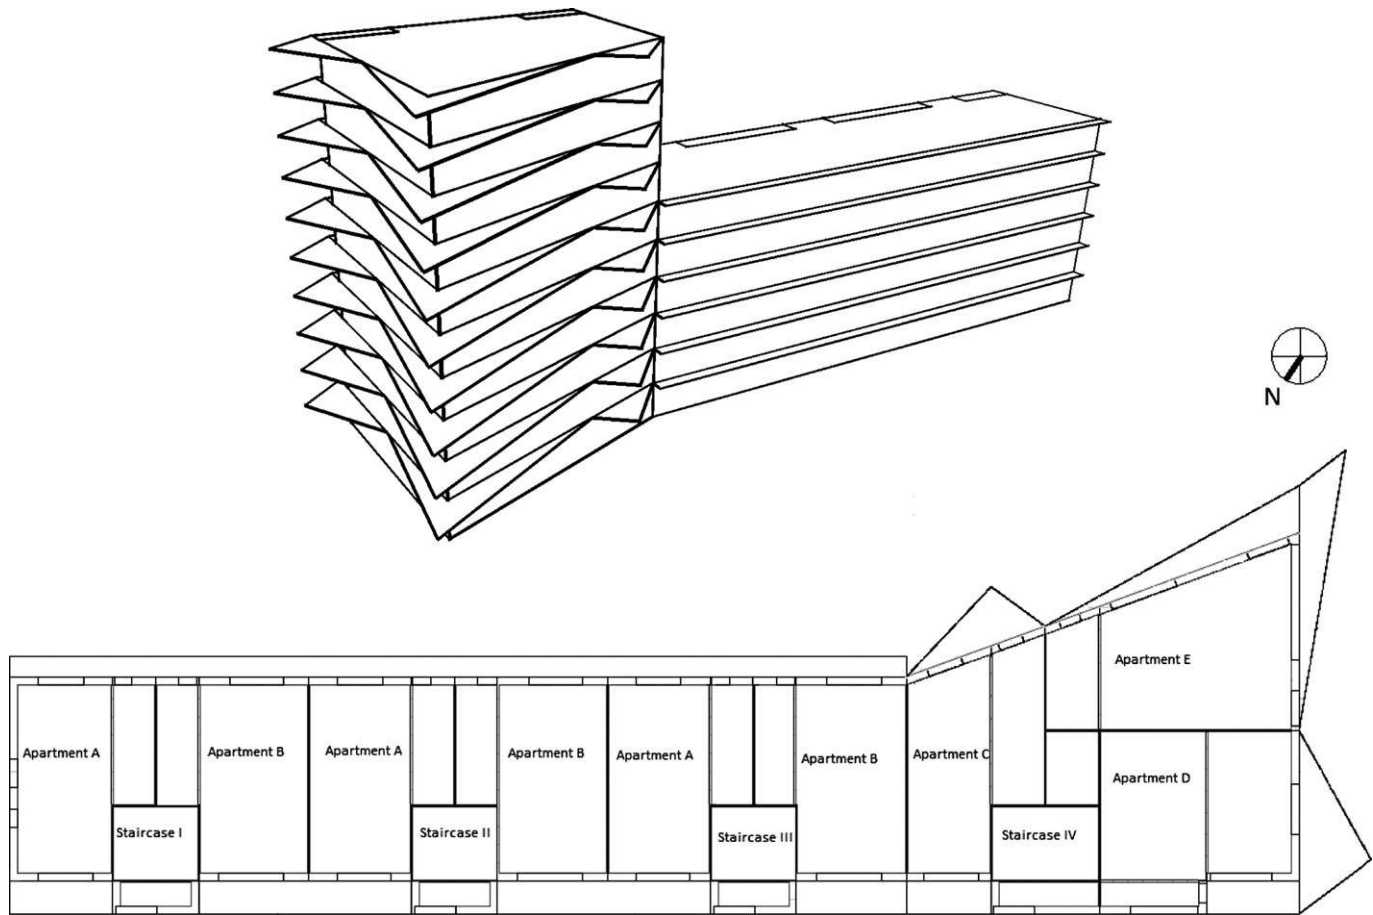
Sketch and floor plan of the reference Net ZEB.
